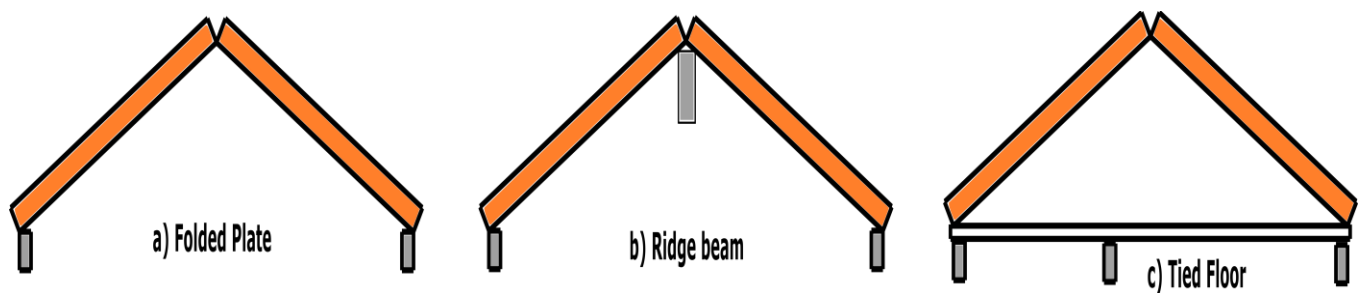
Three types of structural system for roof panels (Kucirka 1989).
